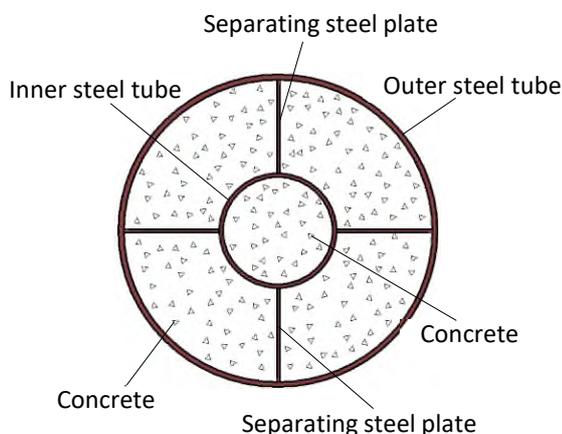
Cross section of multi-cell CFT column with double-layer circular steel tubes
